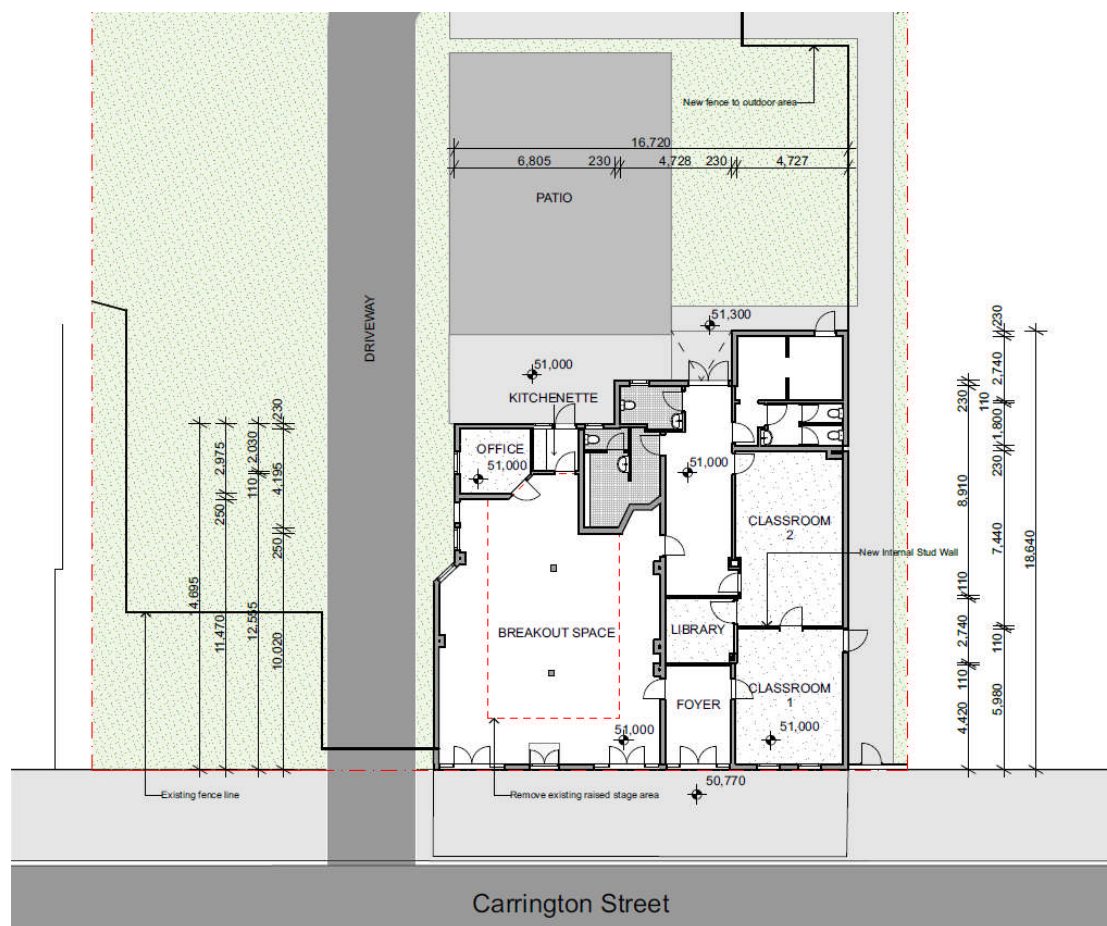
The Ground Floor Plan Alterations. (CKDS Architecture Newcastle)
